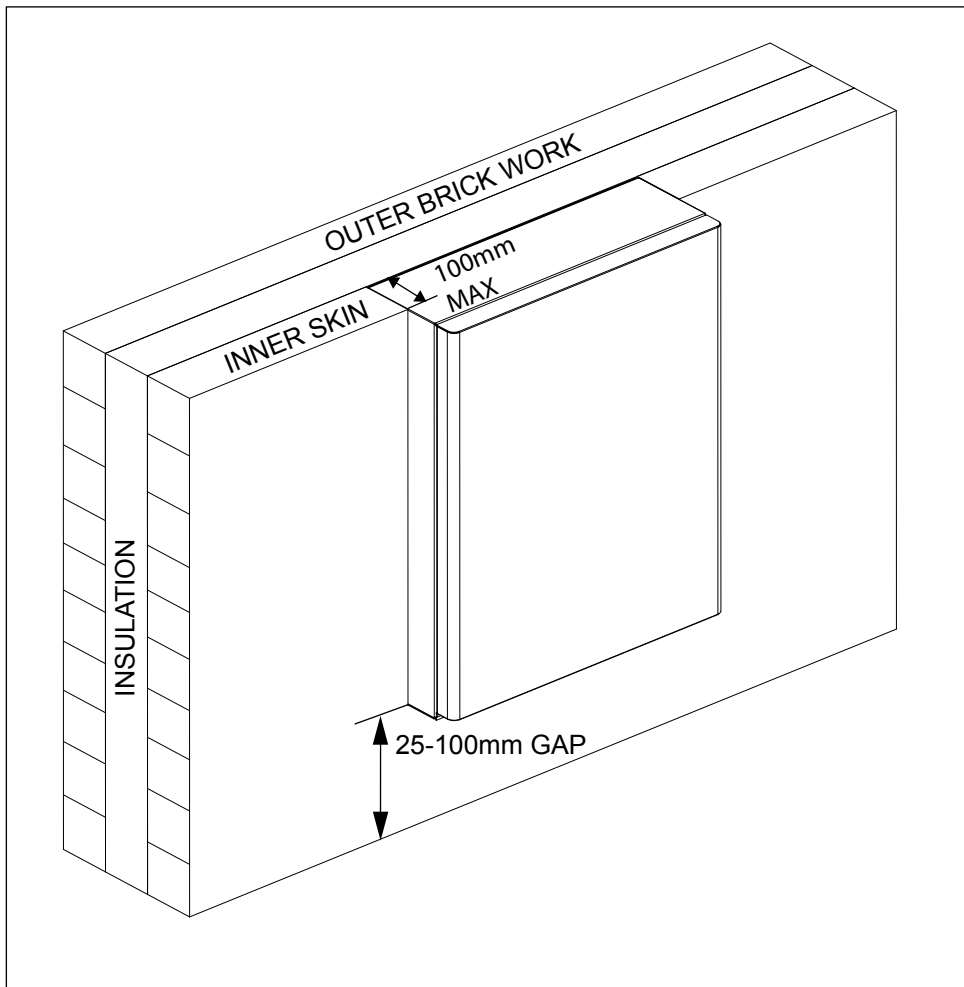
INSTALLATION PARTIALLY BUILT INTO WALL
